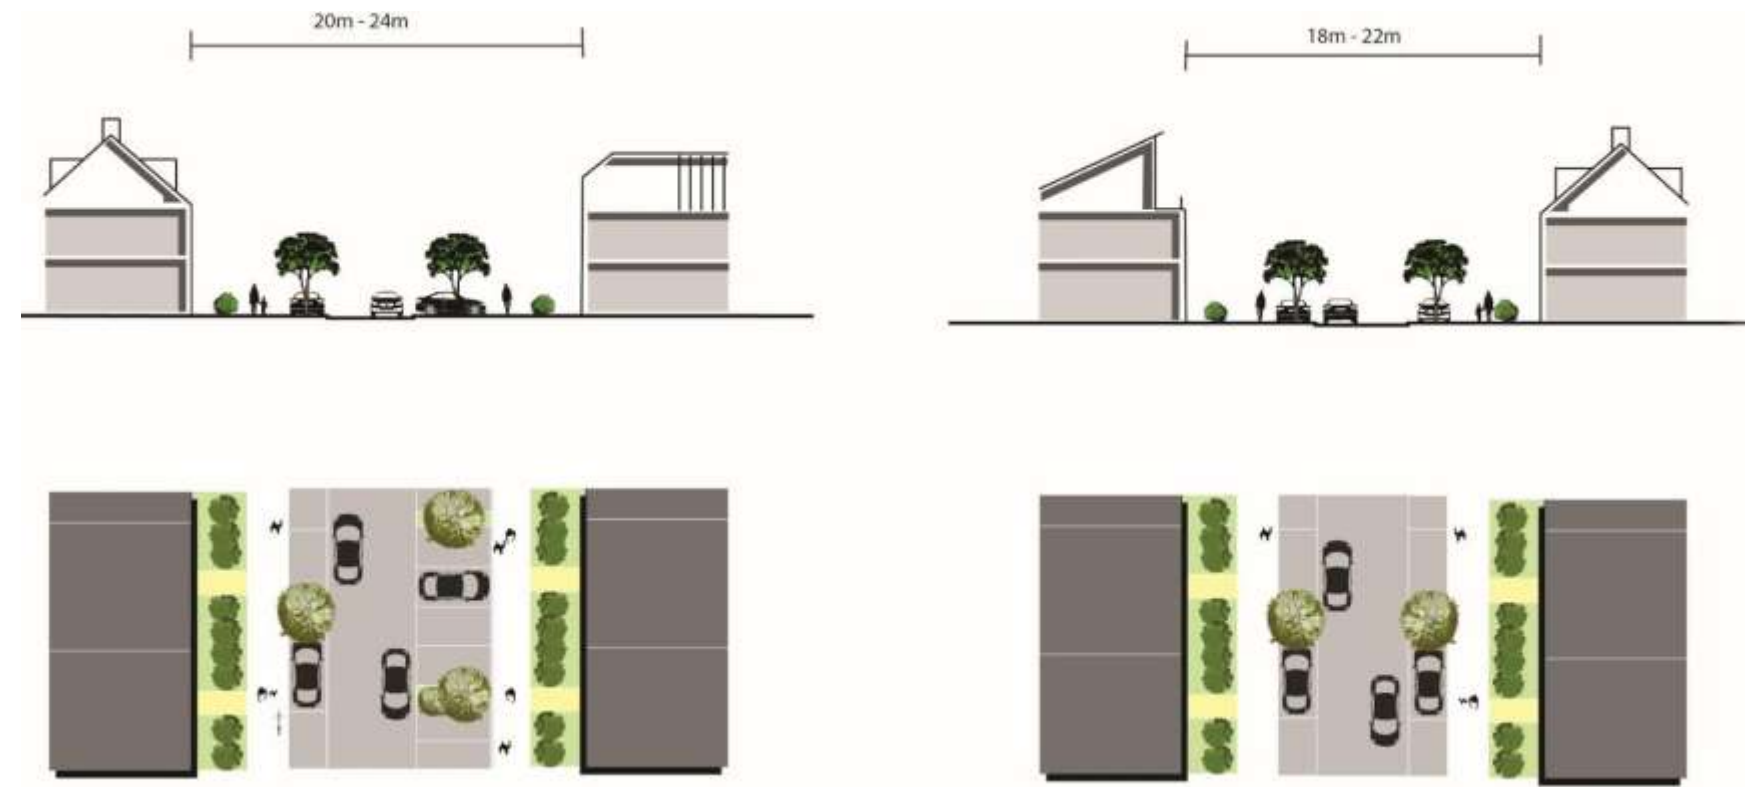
Local Street typical section (photos: Adamstown and Portmarnock, Dublin)
